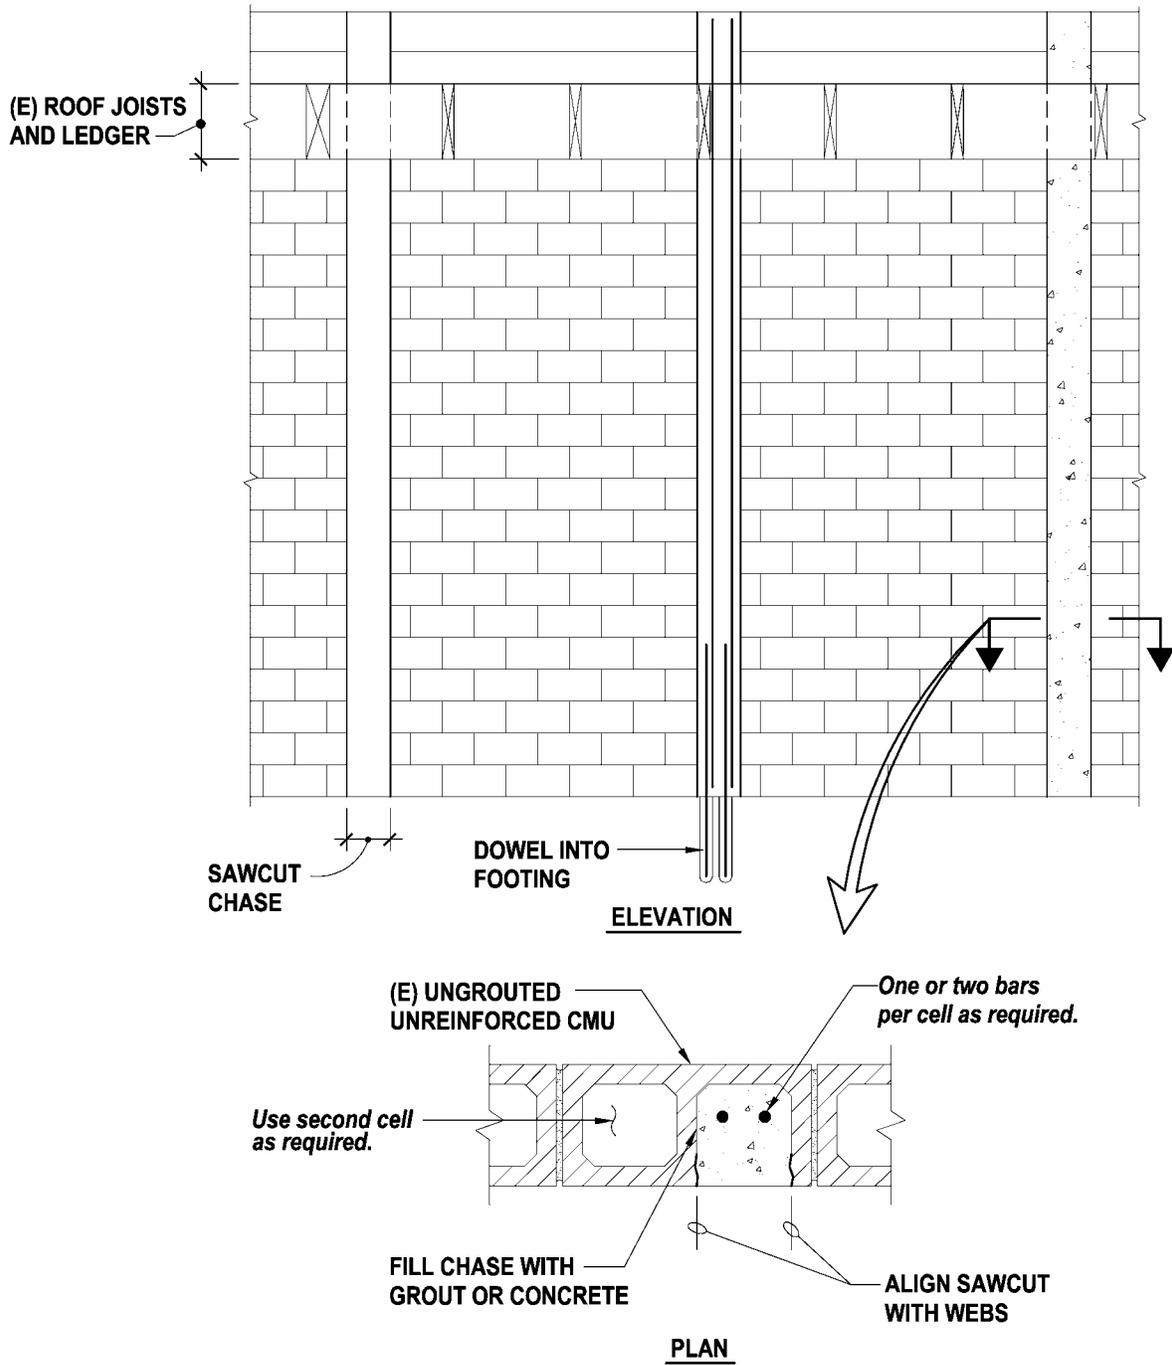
Concrete Ribs in Hollow Masonry
